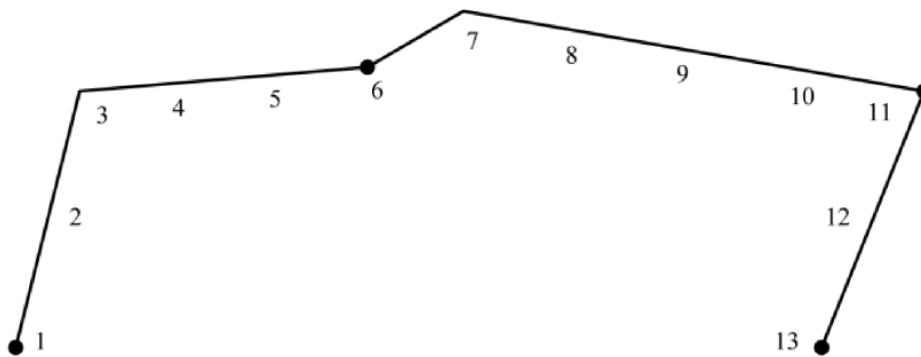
A pitched roof portal frame: Actual collapse mechanism [1]
